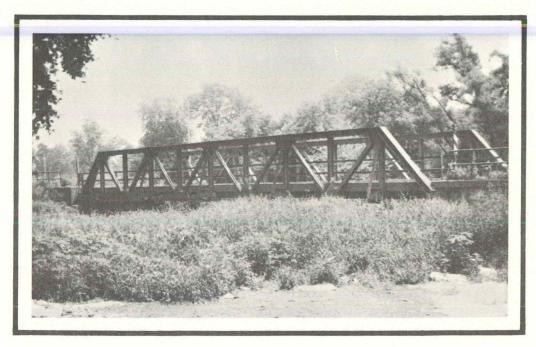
County Road bridge at mile 10.85 (West Branch), looking downstream.
